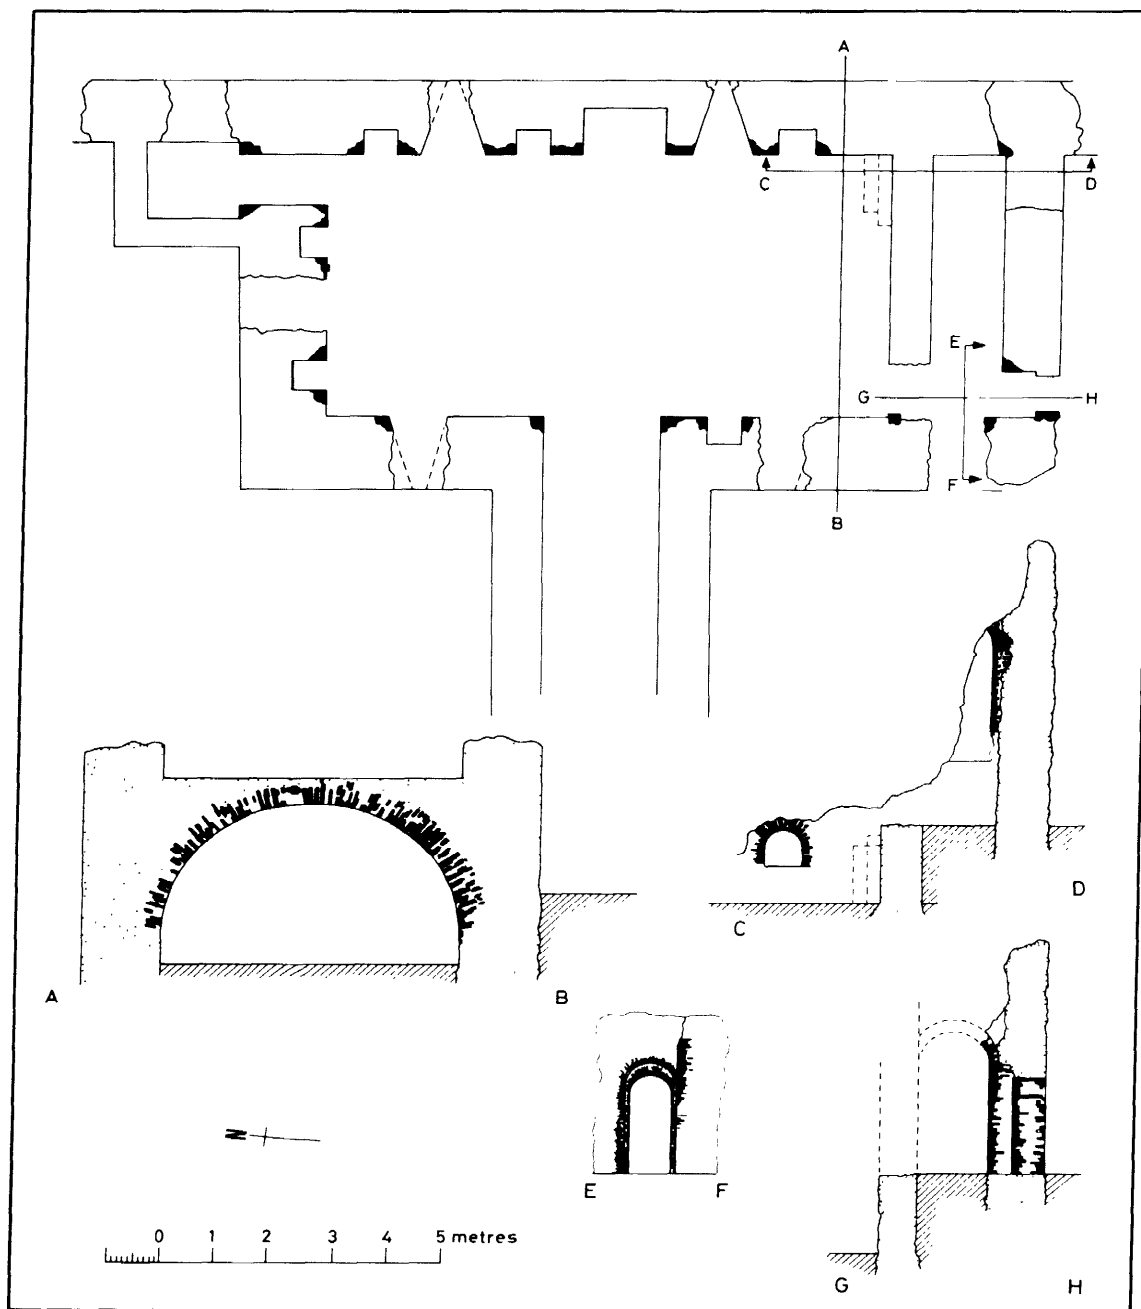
Foundry Yard stone house. Ground plan and elevations (after an original plan made in 1886 by L J Watts)
